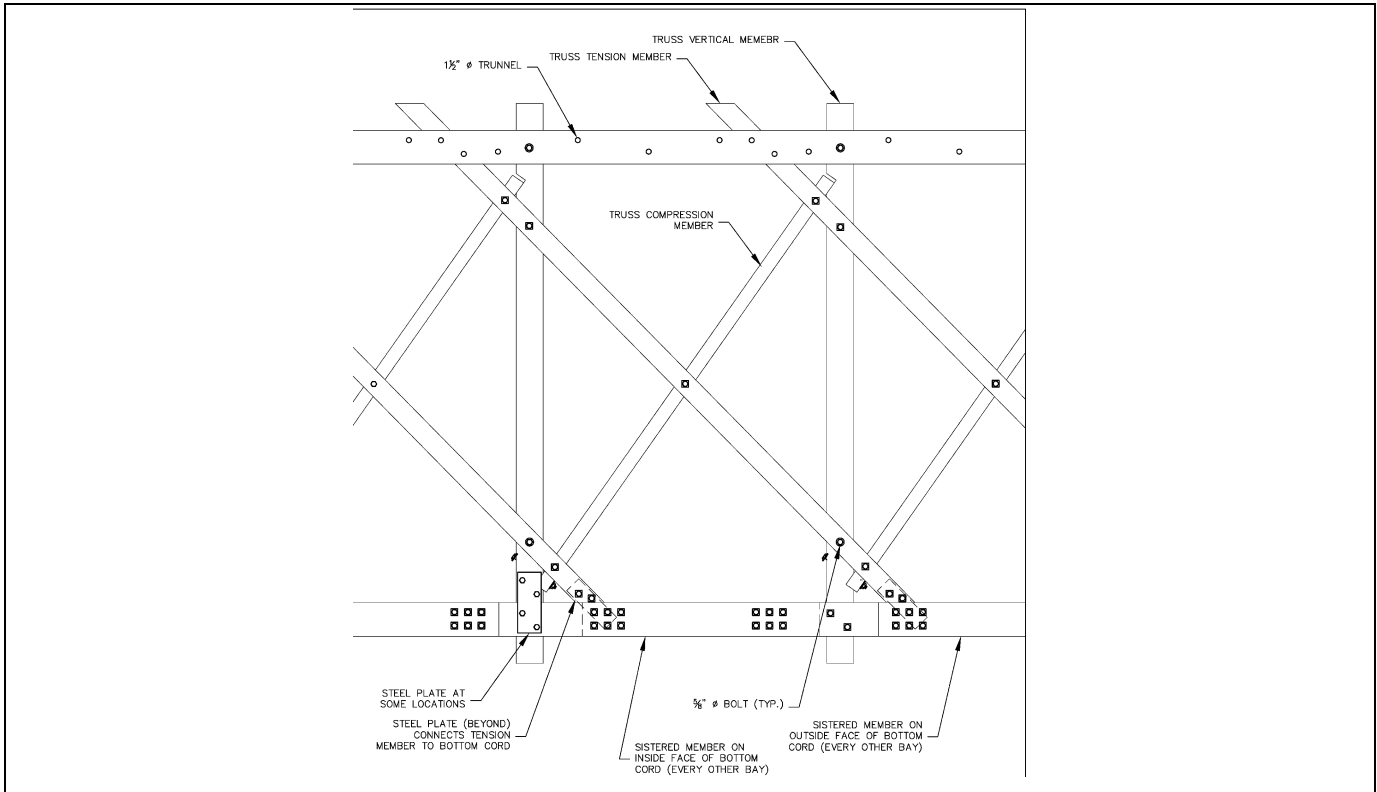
Truss elevation, showing upper chord (source: HEB 2012)
